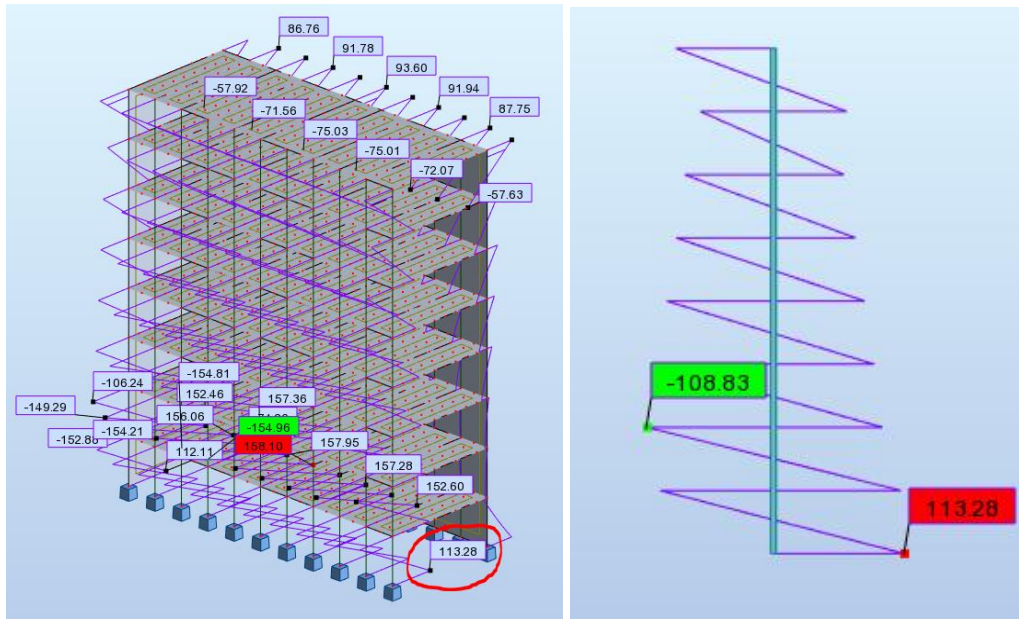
Moments in eight story concrete building (all the numbers were needed to show the relevant one, because the worst moments in the columns are not in the foundation).
